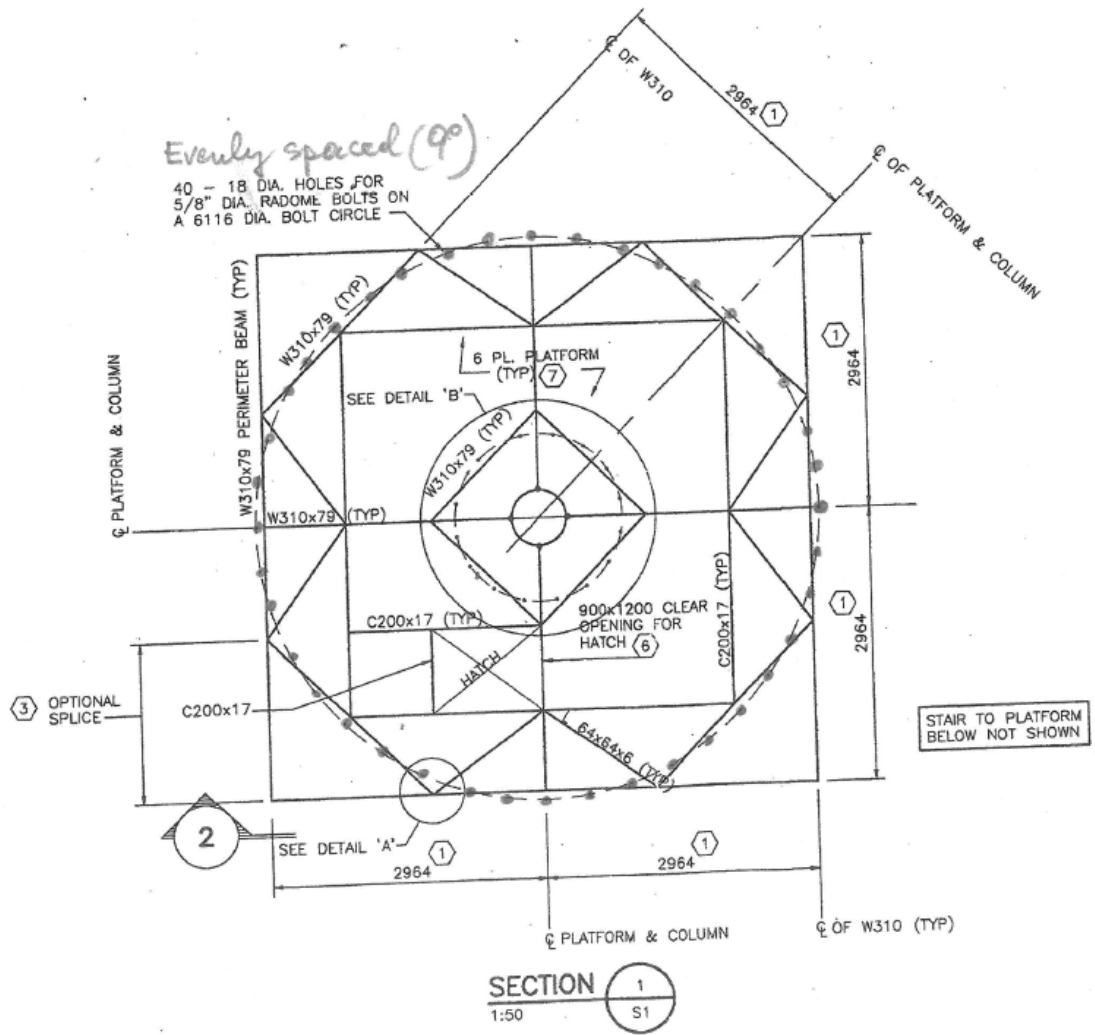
Radome mounting to the tower platform - galvanized steel plates
